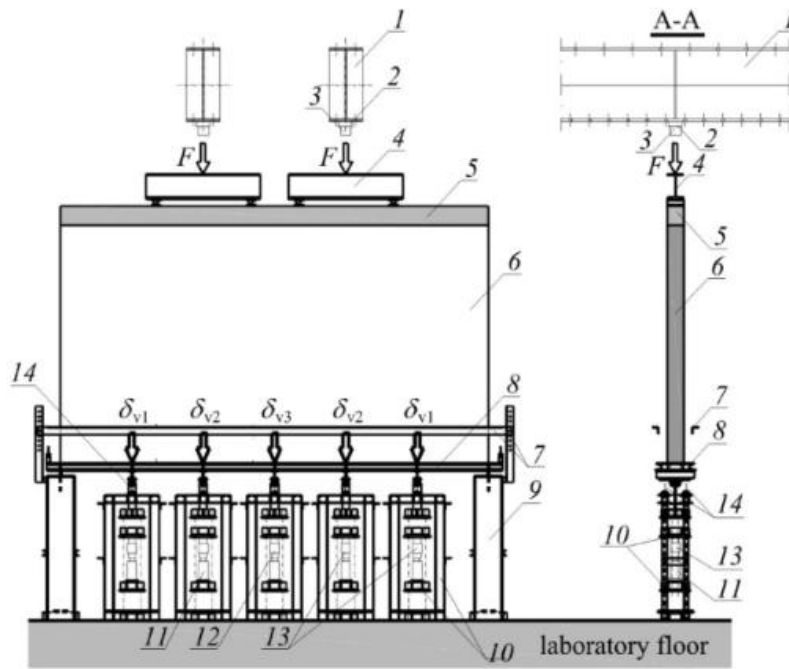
Test stand: 1 – steel frame, 2 – force gauge with range with the range to 500 kN, 3 – hydraulic jack with the range to 500 kN, 4 – steel beam, 5 – reinforced concrete top beam, 6 – tested wall, 7 – members of the system for measuring the vertical displacements, 8 – flexible support (steel beam), 9 – external support of the beam, 10 – elements of the system enforcing vertical displacements, 11,12,13 – hydraulic jack with range to 150 kN, 14 – screws for fixing the deflections. From Piekarczyk [131].
